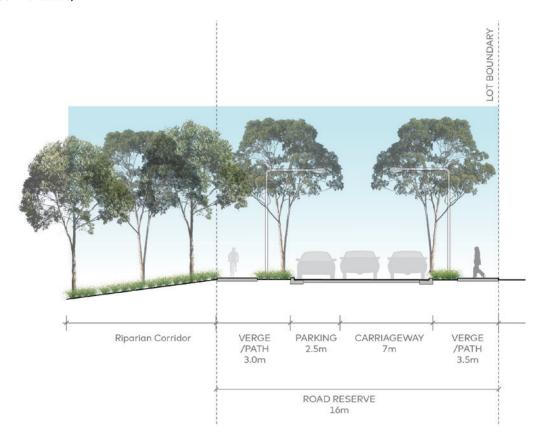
Typical 16m Local Street Section with an Interface to a Riparian Buffer (Source: COX Architecture)
